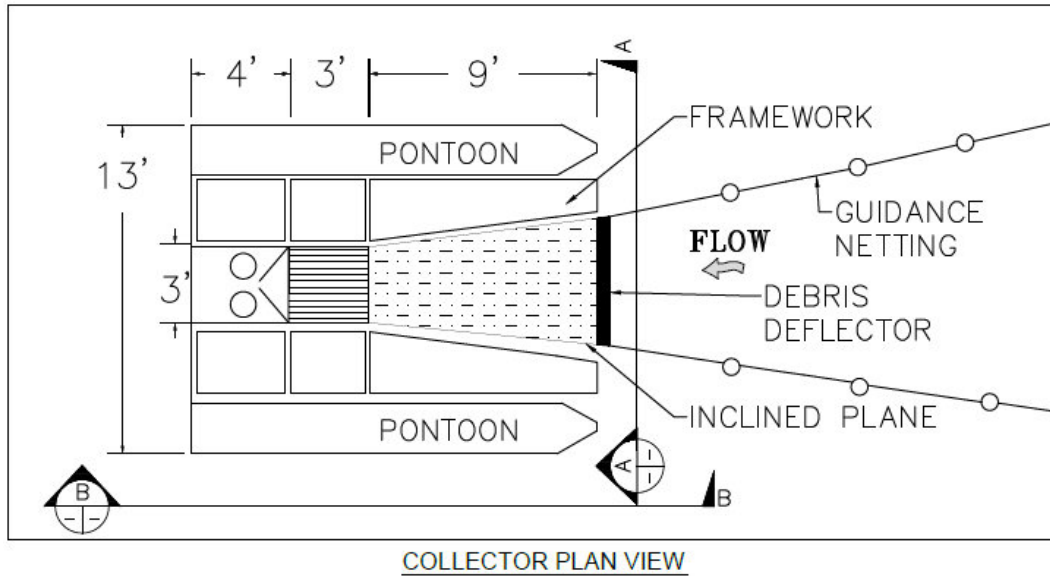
Juvenile collection trap plan view (looking down from above).
